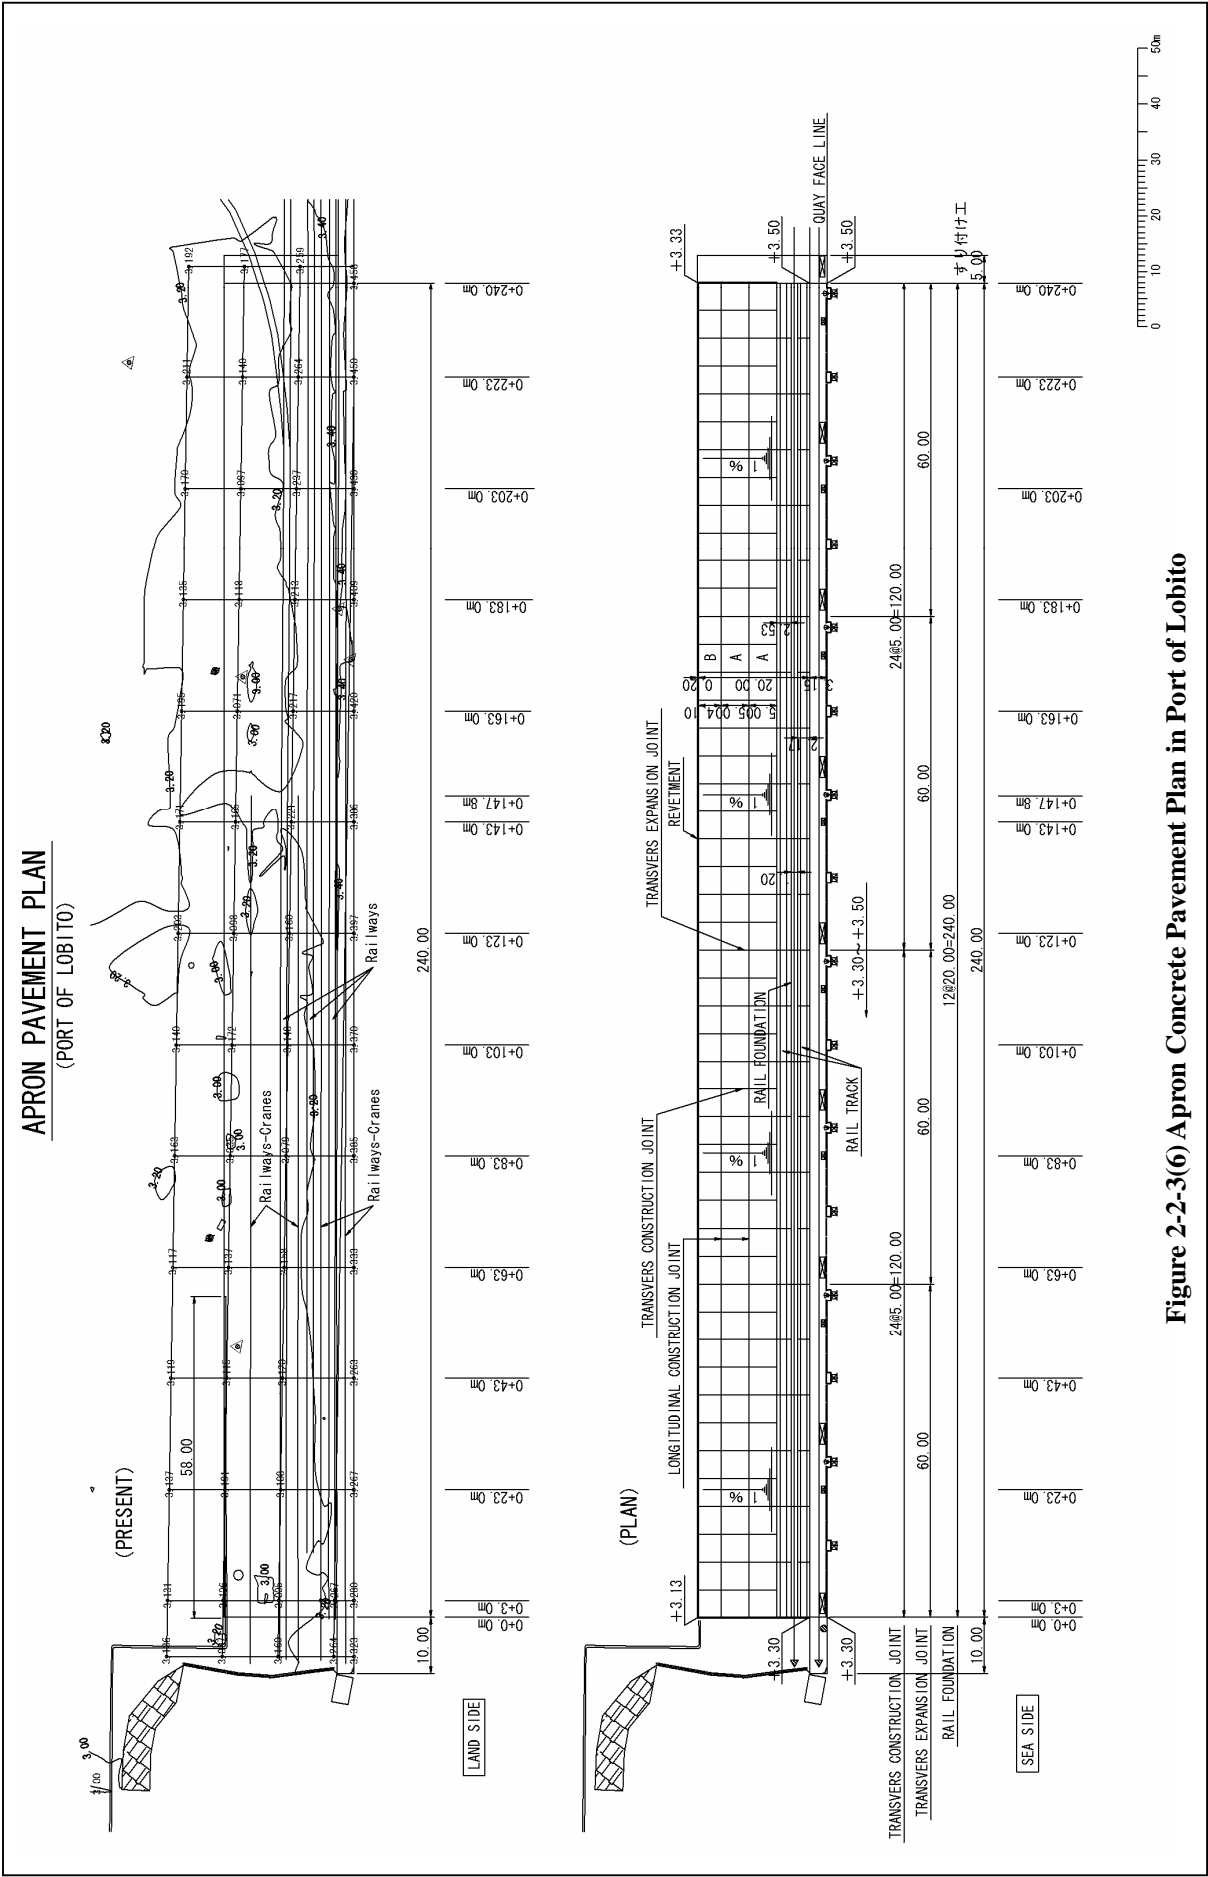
(6) Apron Concrete Pavement Plan in Port of Lobito
